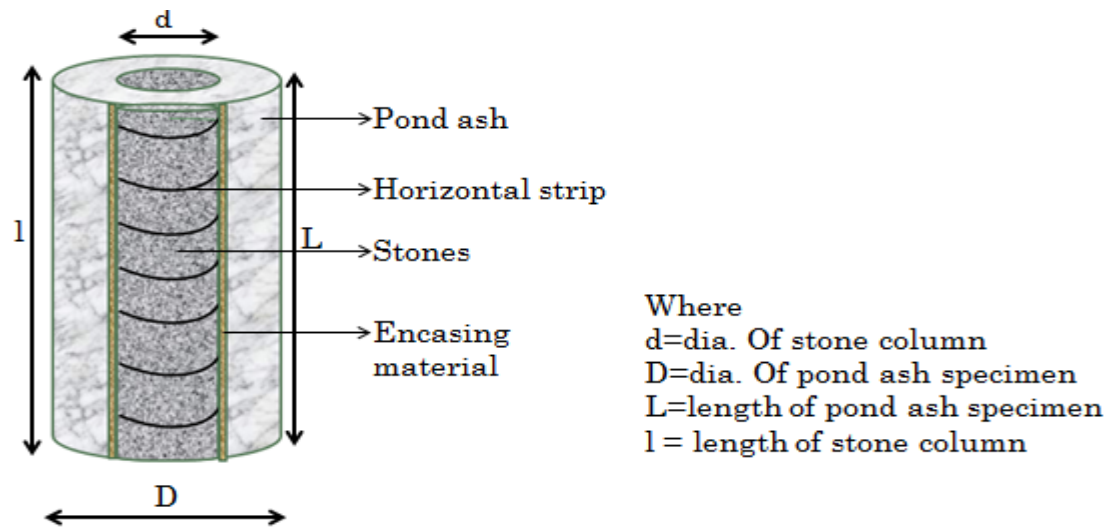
Schematic diagram of stone column embedded in pond ash
